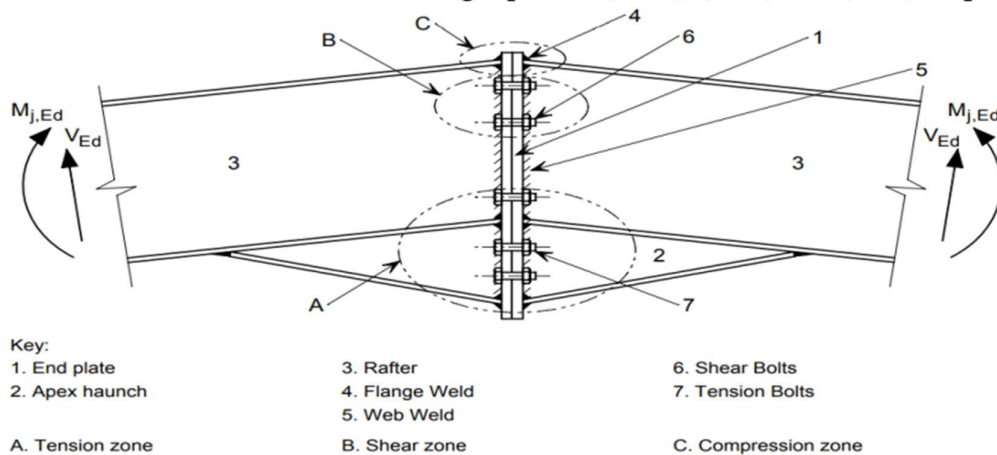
Portal frame apex connection with bolted extended end plate (NCCI, 2008)
